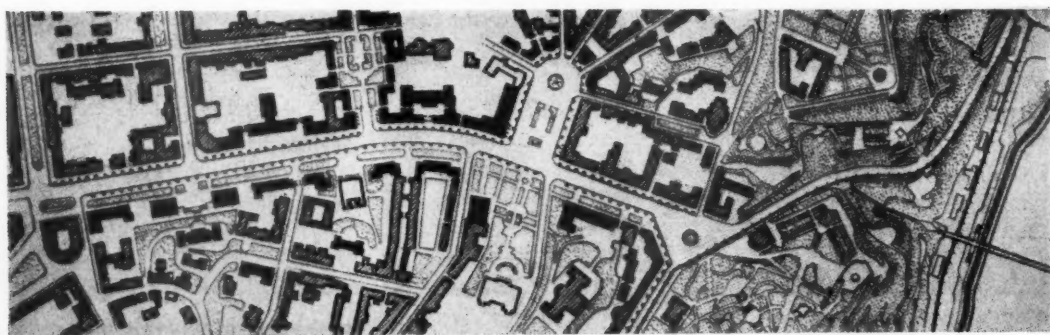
(above). Plan of Kreshchatik, the war devastated and now rebuilt main street of the city. New buildings are shown in black, restored buildings are hatched. The west bank of the Dnieper is at the right of the plan.
